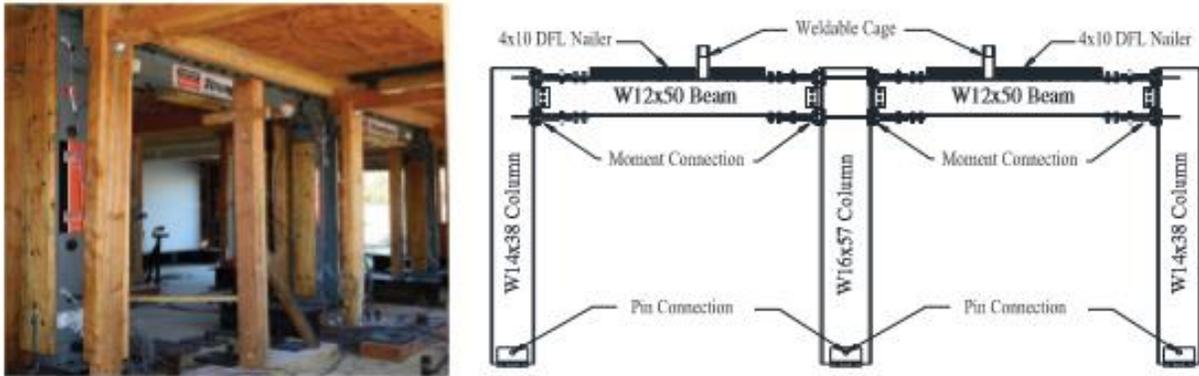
6: SMF (PBSR) retrofit installation and elevation (Bahmani et al., 2014)
